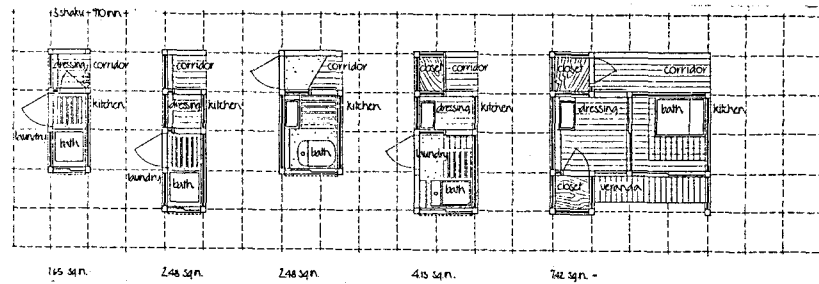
Typical bathroom plans (Engel, 1964: 239)
